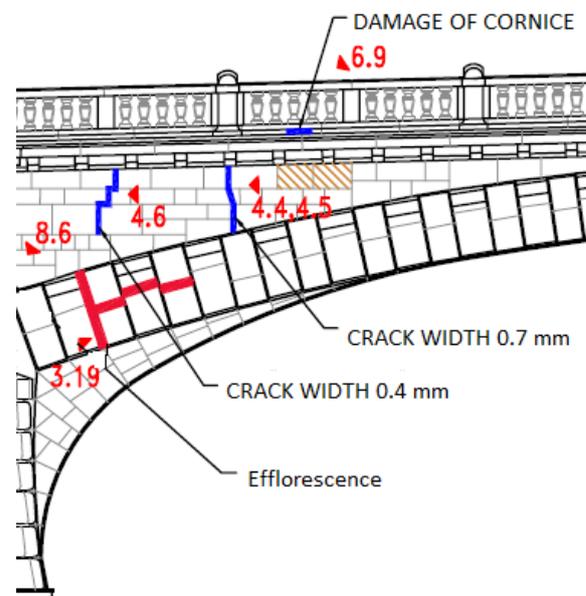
Mapping of visible damages in the spandrel wall near pier No. 2
